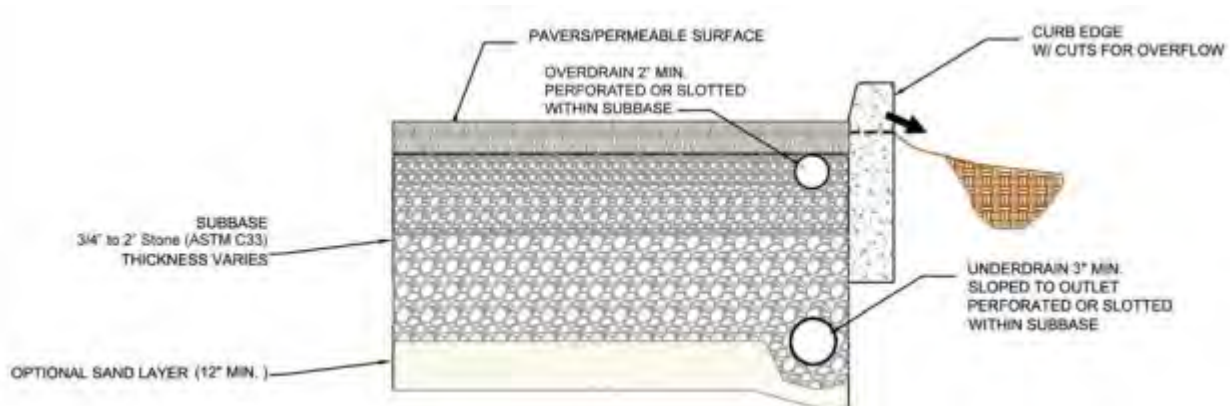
Typical Cross Section of Permeable Pavement (MDE 2009)
